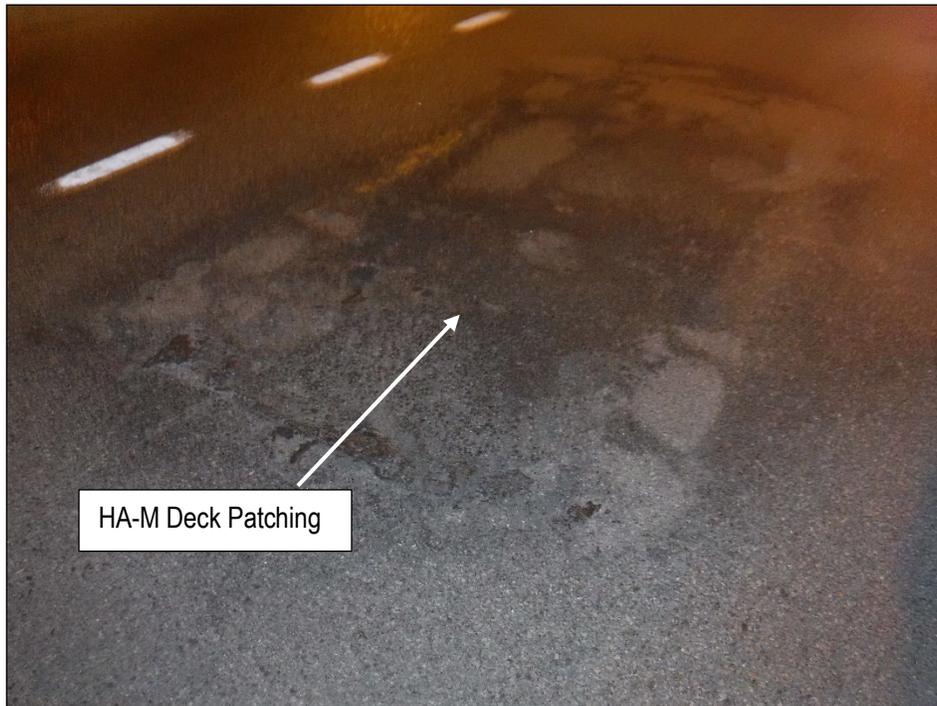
View of HA-M on the I-24 bridge over North 1st Street.
